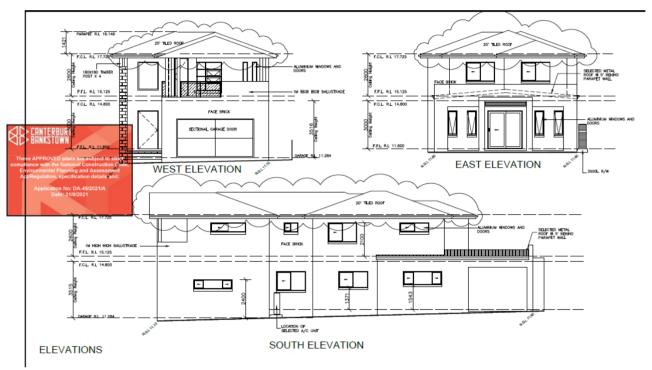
Approved Development at 12 Septimus Avenue, Punchbowl (Inkon Plans)
